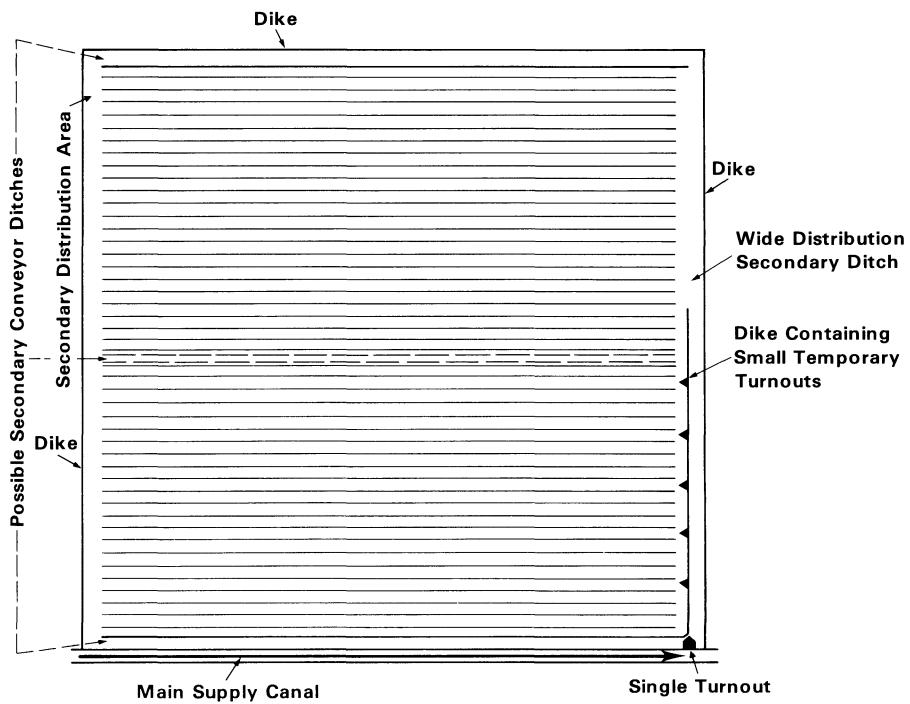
Field plan for row or bed irrigation to minimize erosion when single turnout is used. Suggested locations show possible use of secondary conveyor ditches which may be used.
